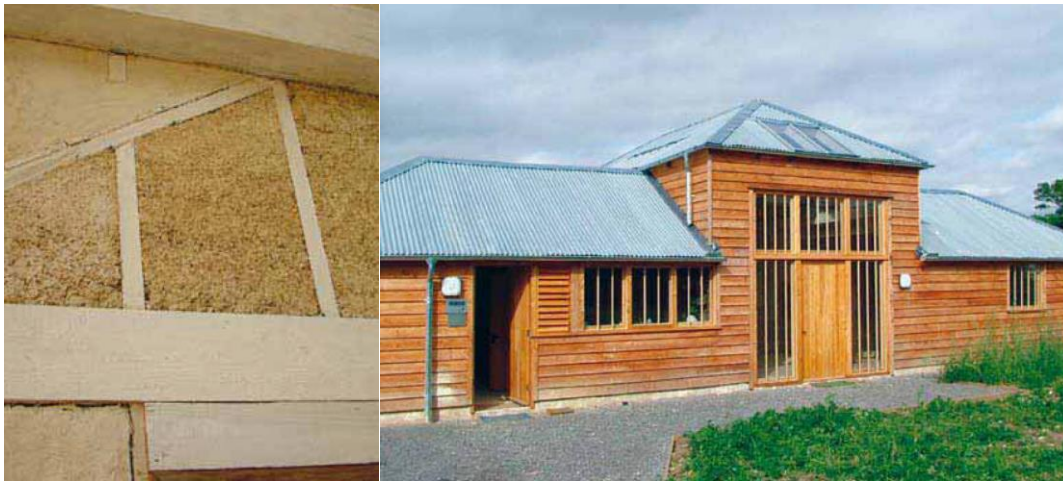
Project by the Greenlight Trust on an old timber framed foundry (a) detail showing hempcrete (b) overall view. Extracted from Bevan and Woolley (2008).
